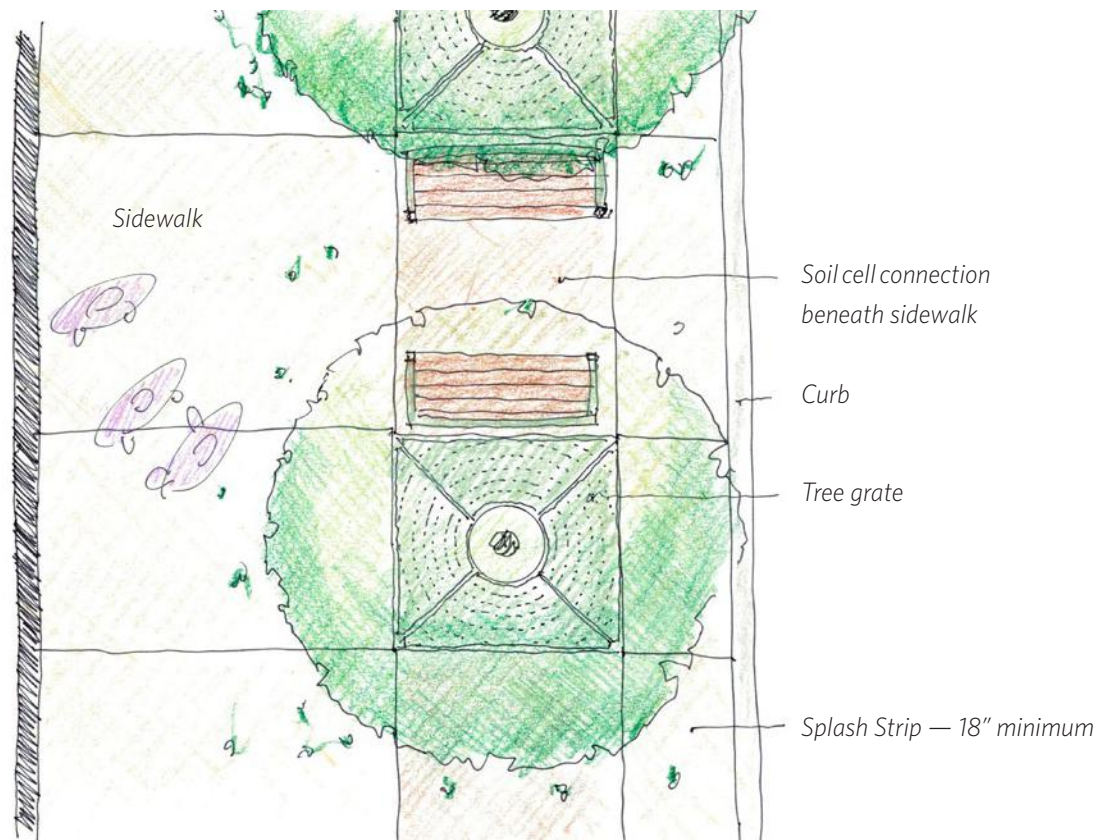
Street Tree Planting Details with Structural Sidewalk — Plan
